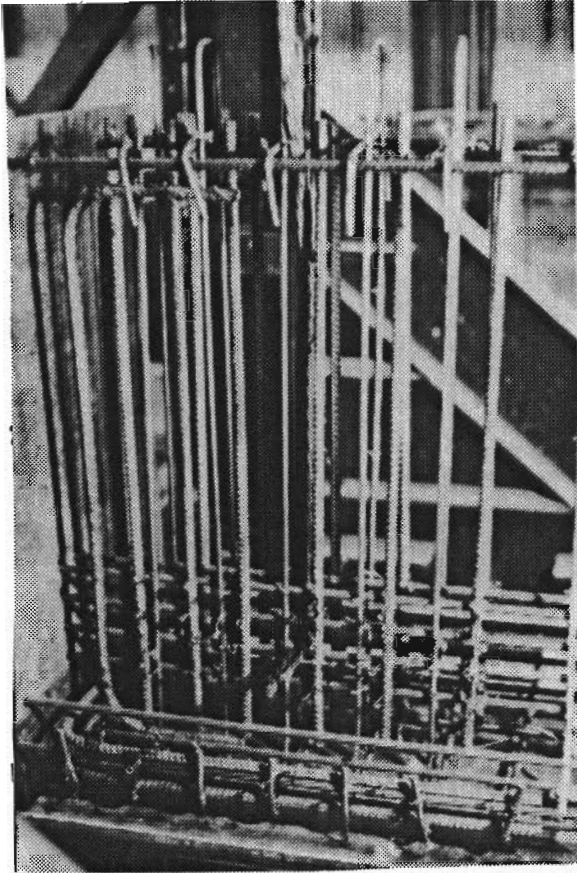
Photograph of Texas Type C end anchorage reinforcement (left) and midspan shear reinforcement (right) with strain gages on stirrups
